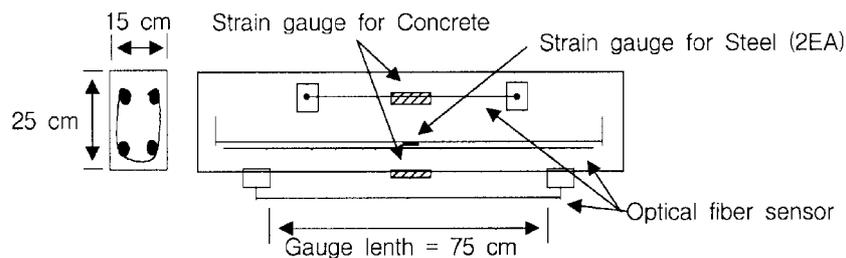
Specimen for compressive test with embedded steel (CTL II)
